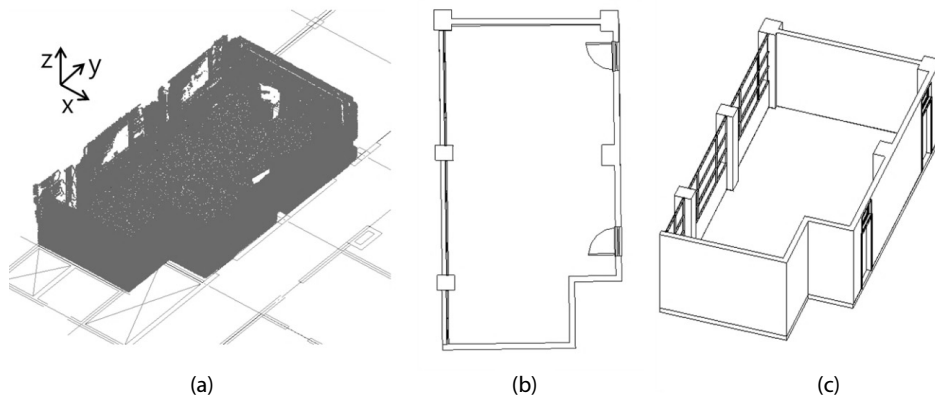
As-built Revit Model Including Main Indoor Components (a) 3D Point Cloud Registered on the CAD Drawing (b) 2D Geometric Drawing (c) 3D Geometric Drawing
